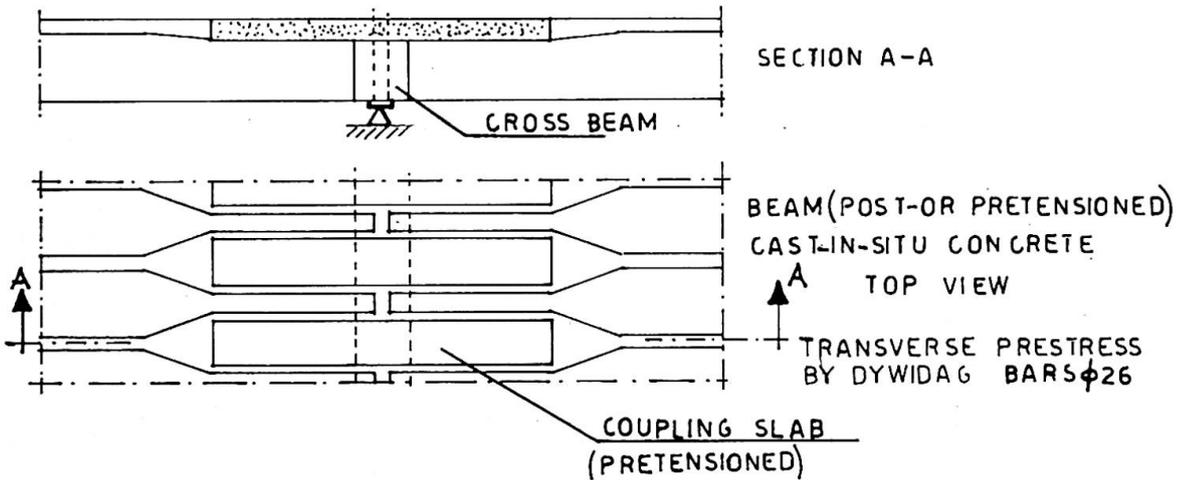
Connections for single span bridge beams to continuous structures.
